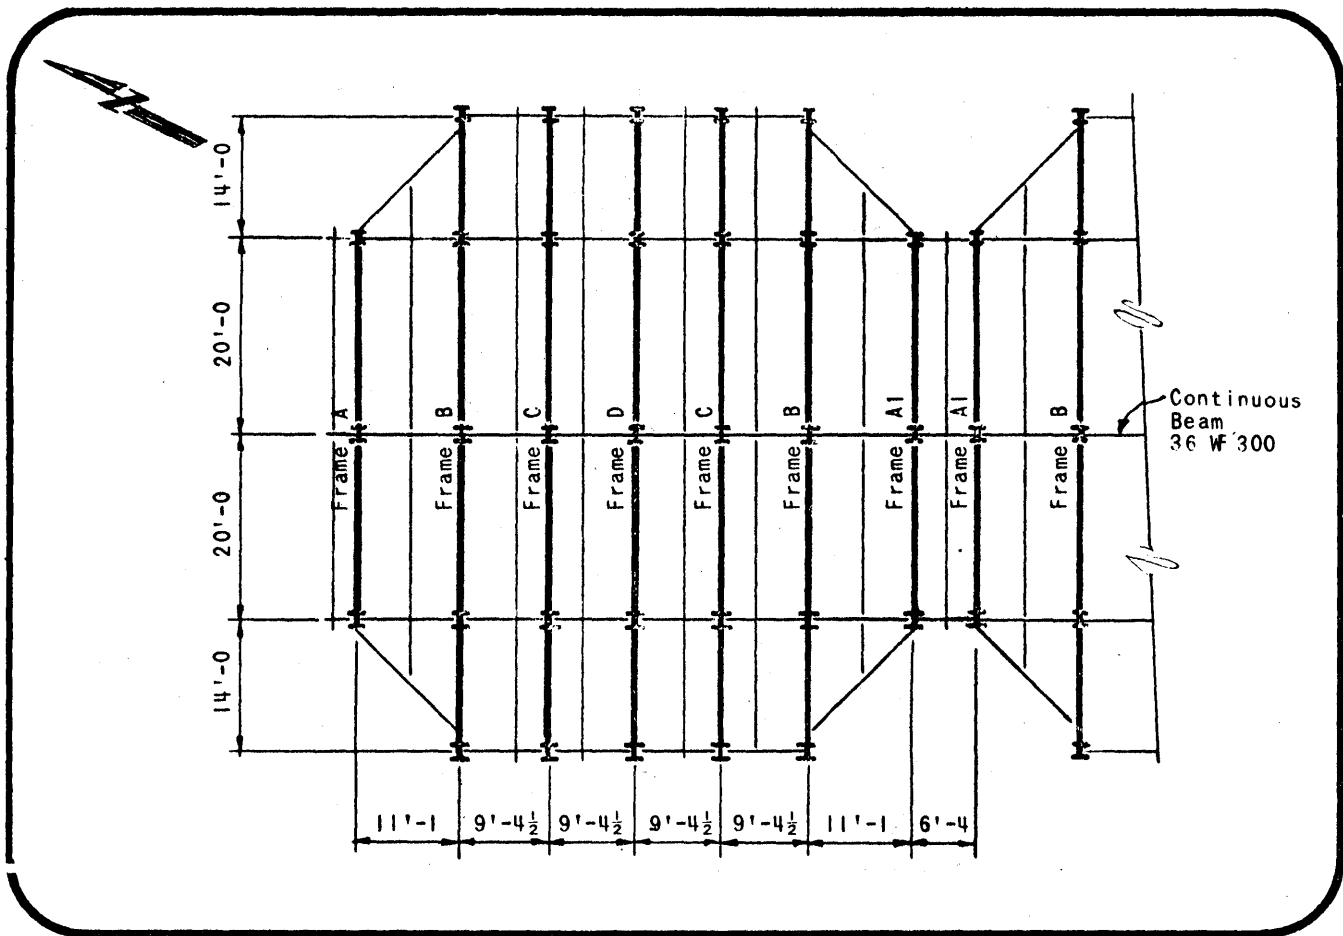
Plan Showing Rigid Frame Layout and Bin Floor Framing.
